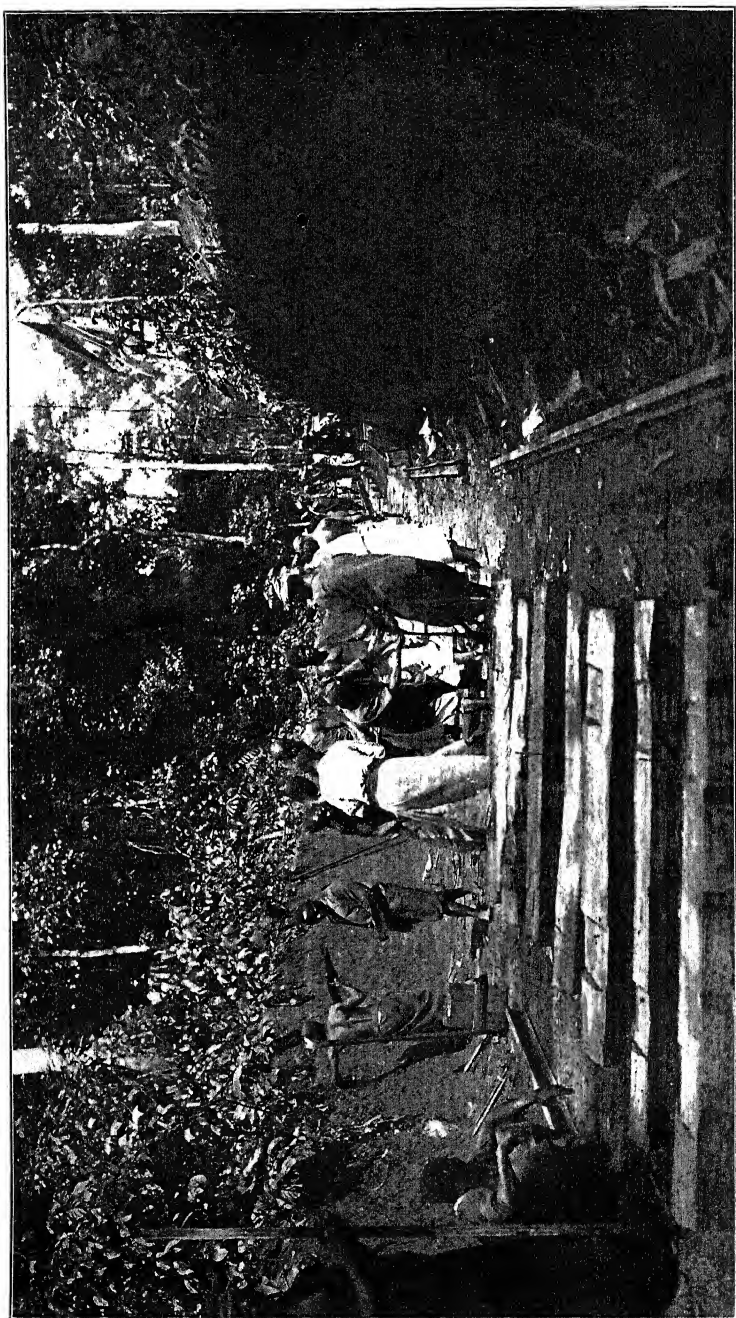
RAILROAD CONSTRUCTION, GRAND LAKES RAILROAD.
